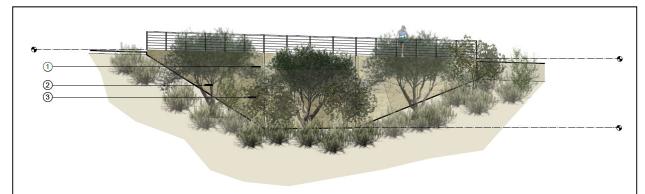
As discussed at length during various MBAR meetings, the proposed retaining walls (sample cross section shown above) would range in height from approximately 4 to 16 feet in height. Native vegetation would be planted alongside these retaining walls in an effort to conceal them from view to the maximum extent practicable, particularly from prominent public viewing points along Hot Springs Trail.
